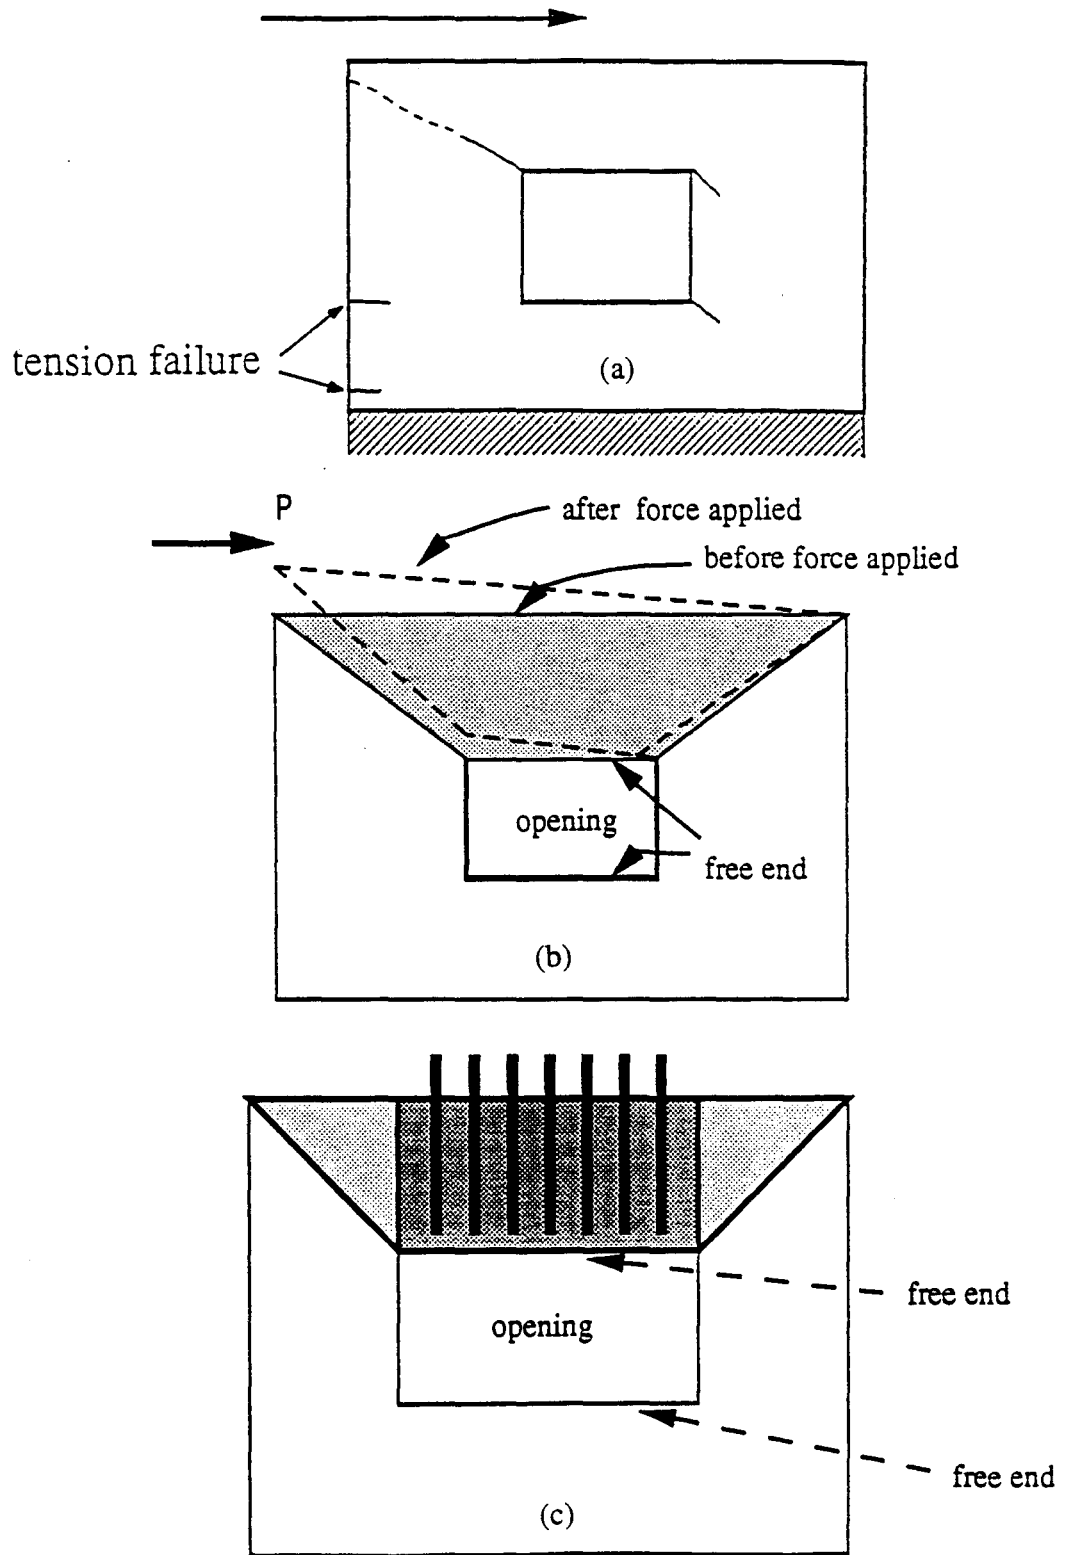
Possible initial cracks of perforated shear wall and cracking mechanism in top block of perforated shear wall
